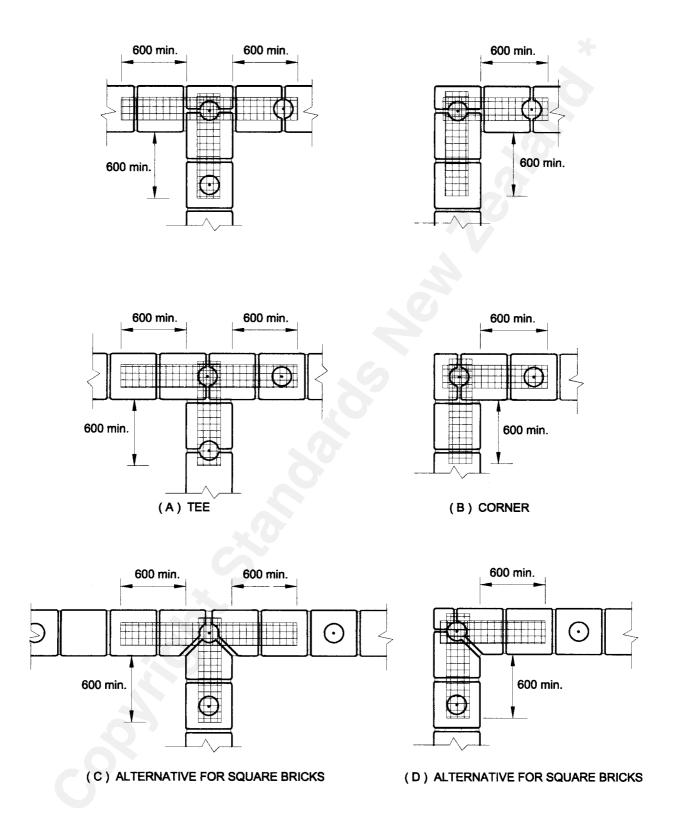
Pressed brick bond at "tee" intersections and corners
